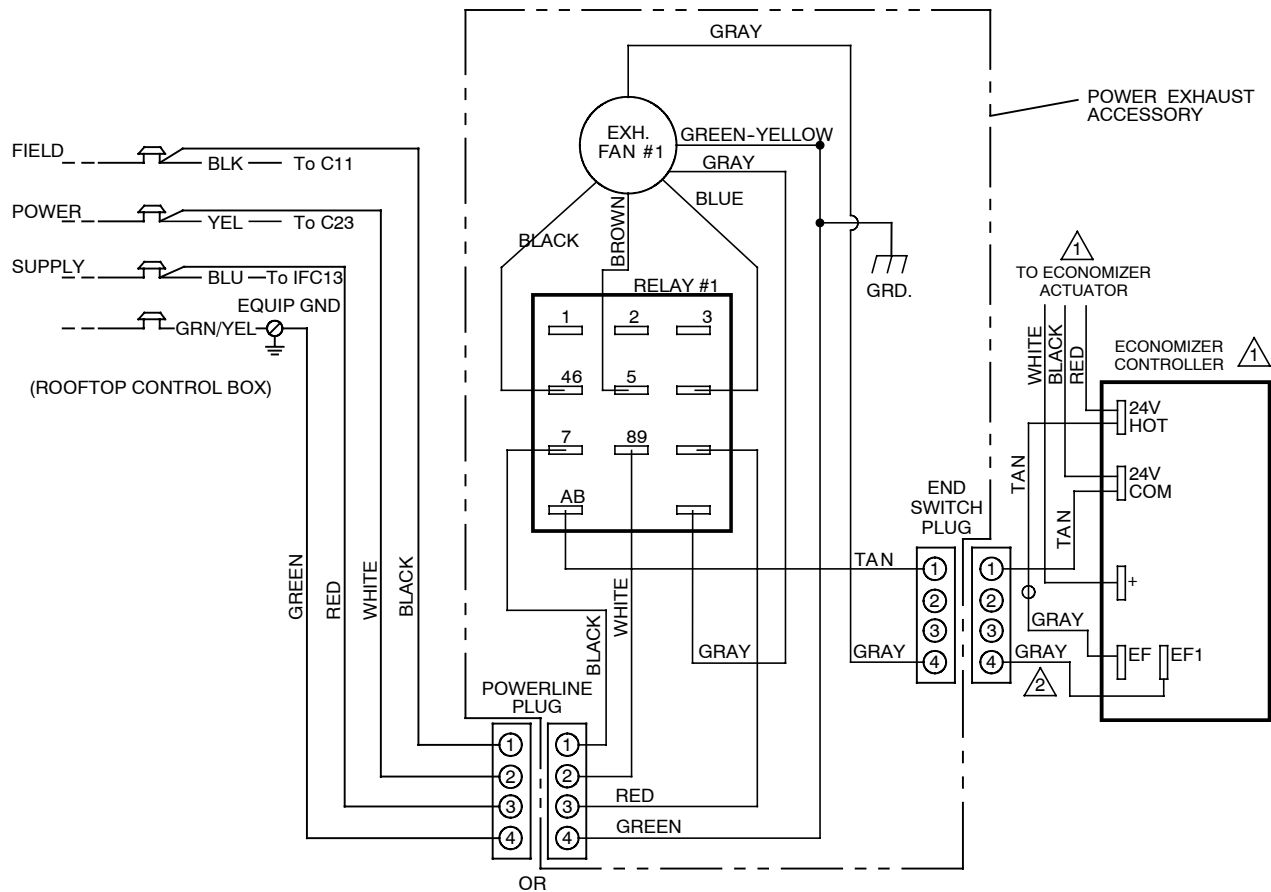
Single Fan Power Exhaust Wiring for Economizer with W7212 Controller - 460V Units
